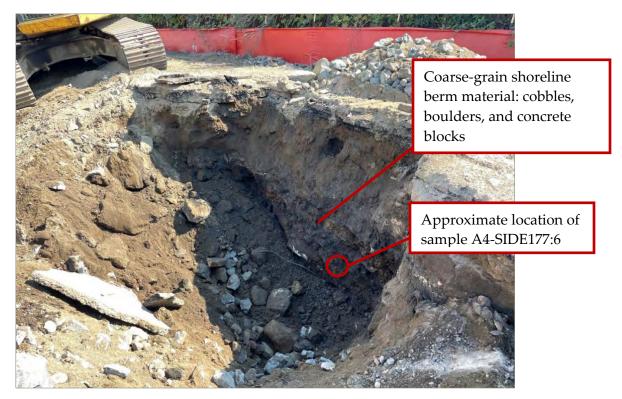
Excavation Activities at Sample A4-SIDE177:6. View direction is south. Photo taken on August 31, 2022.
